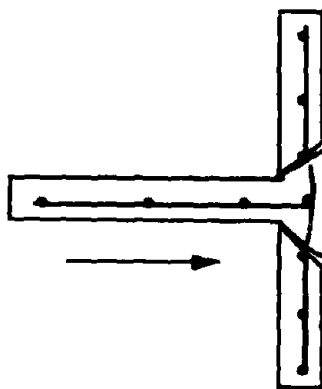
Punching Shear Failure of T-Section Flange Due to Web Sliding on Base
